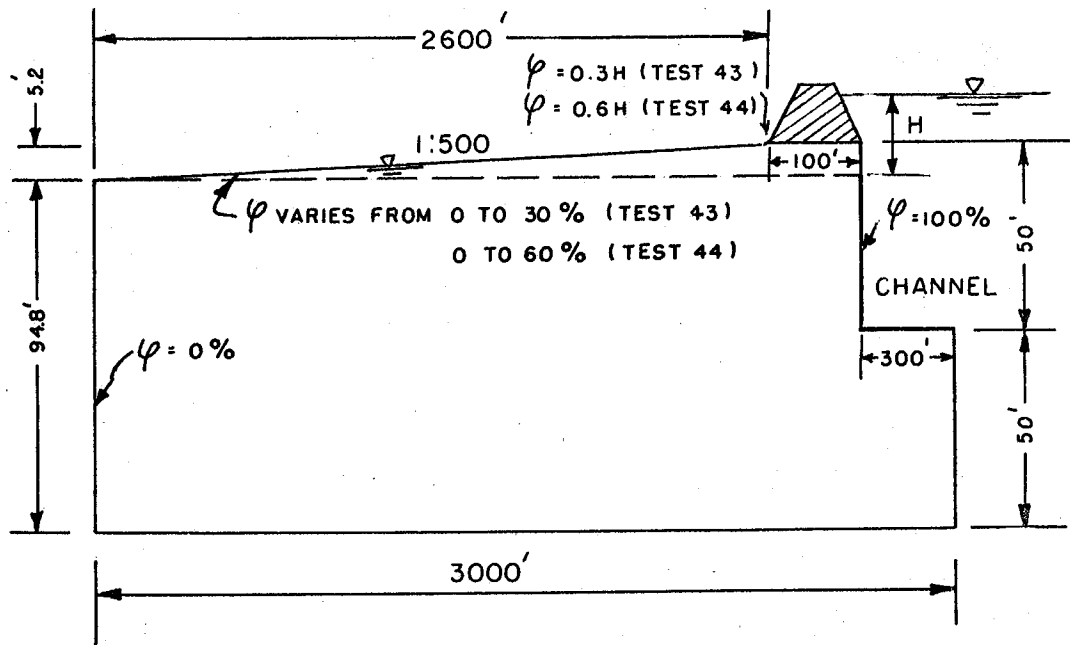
CROSS SECTION WITH SLOPING WATER TABLE
